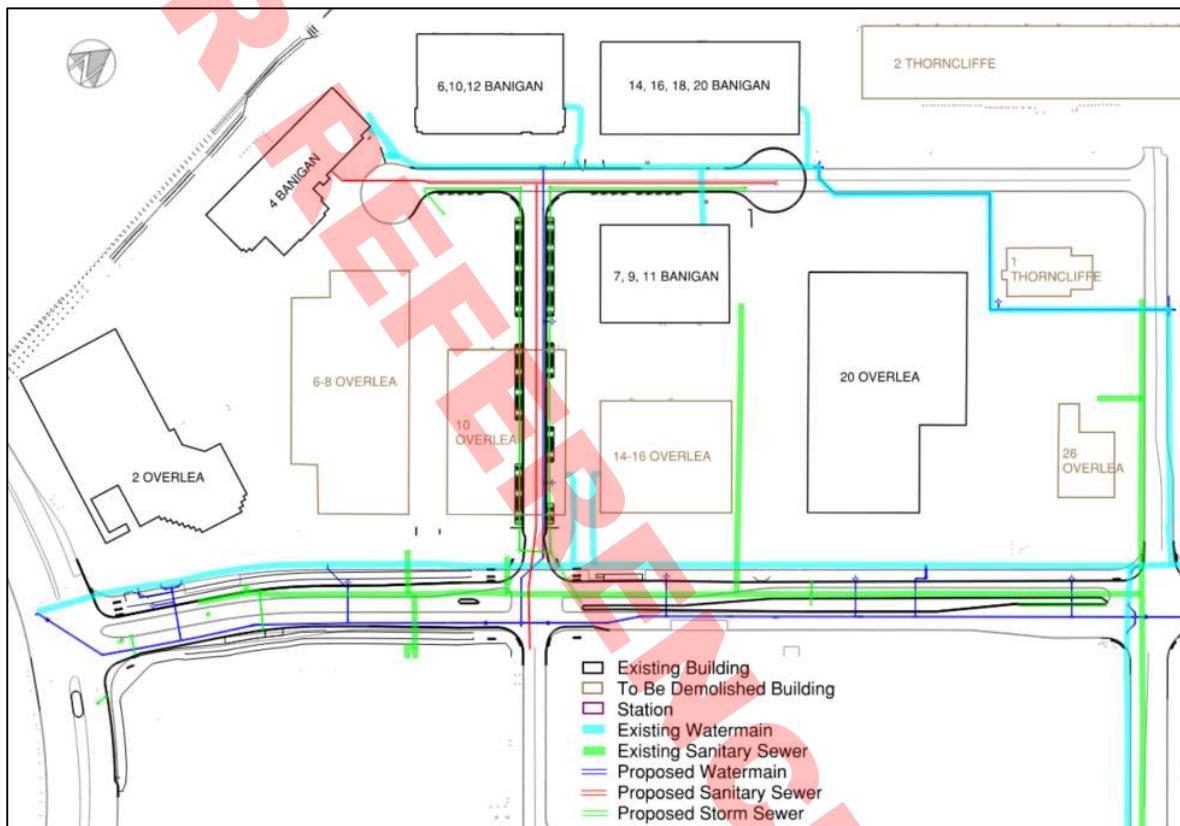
Overlea Boulevard Key Plan - Wet Utilities Overview
